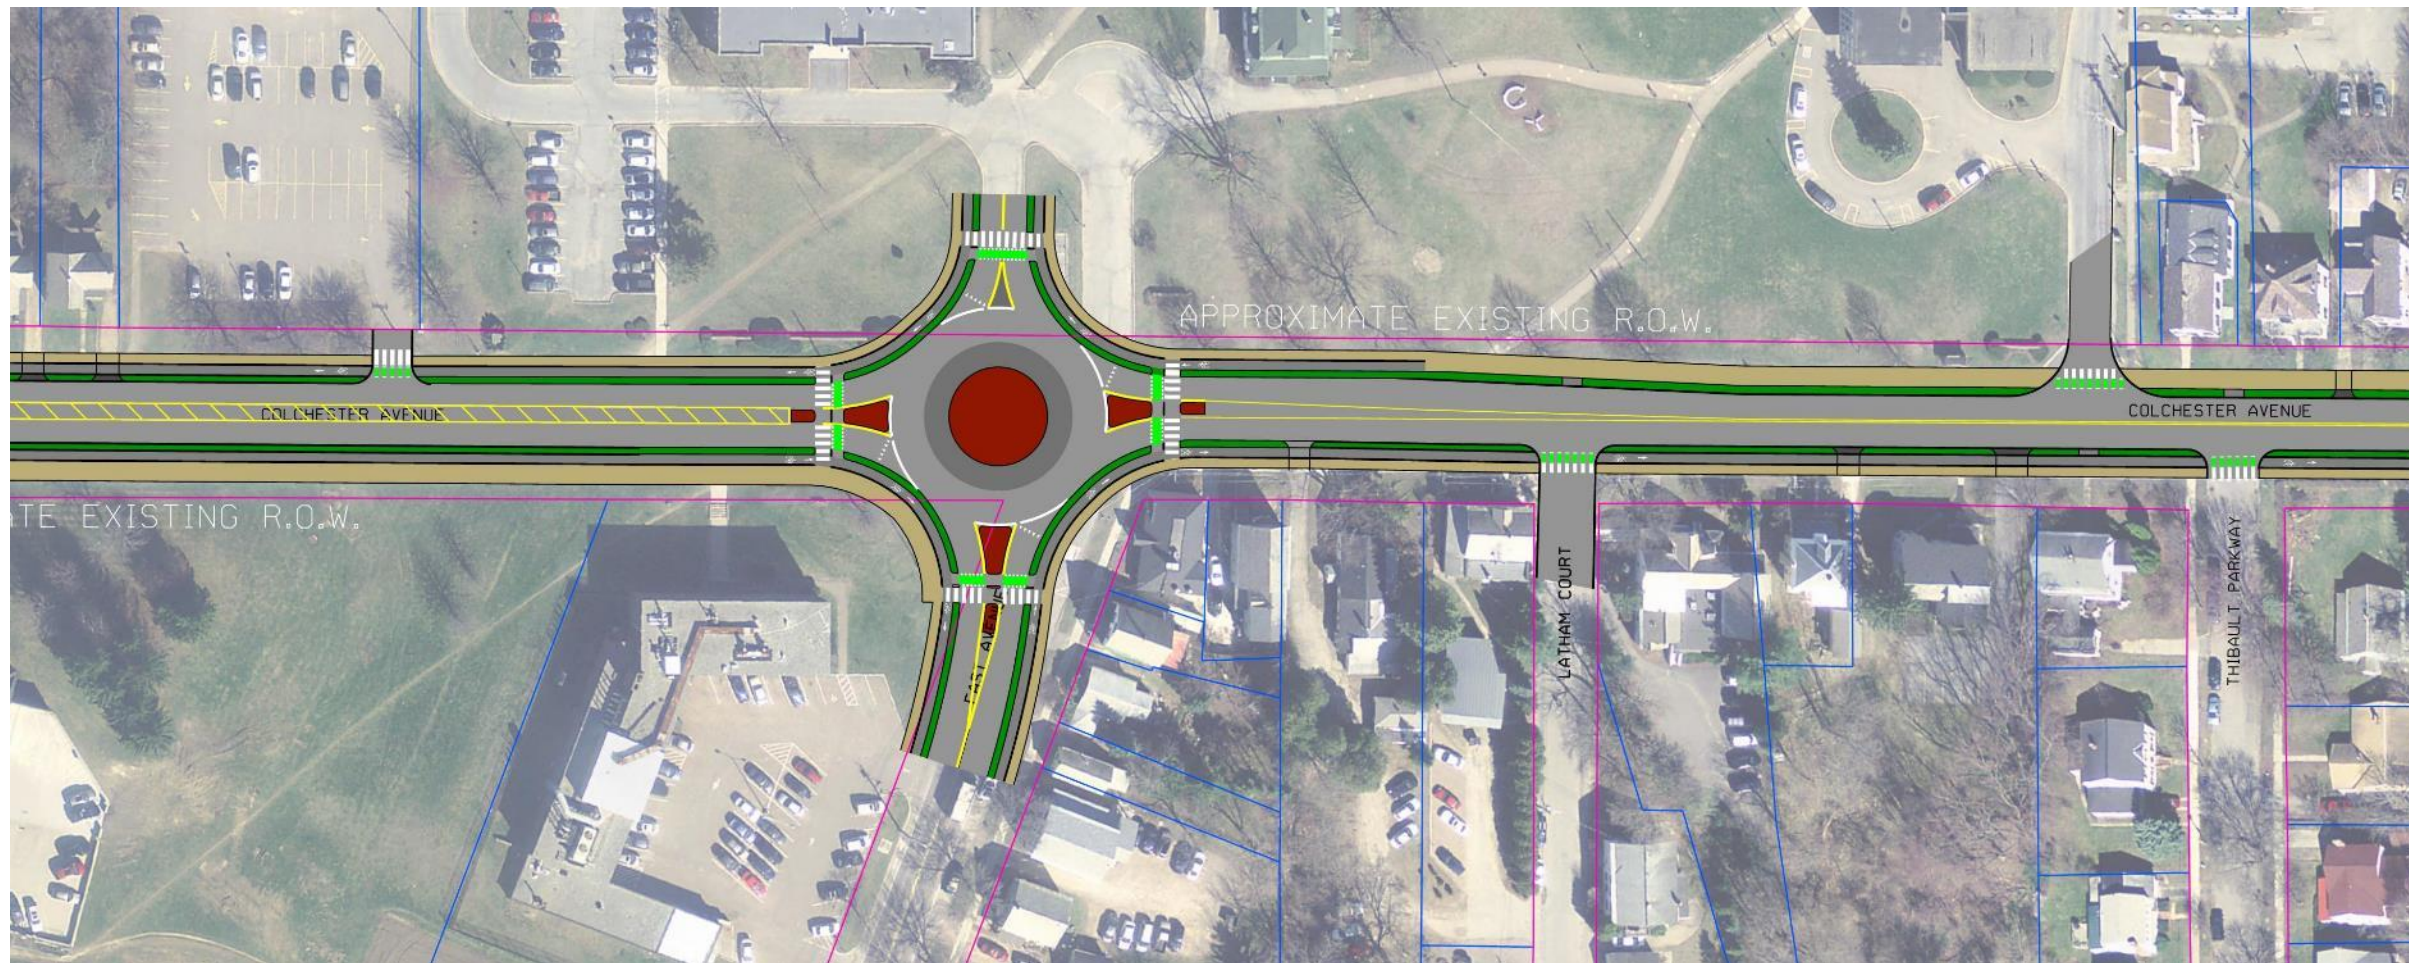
Colchester Ave & East Ave Intersection Alternative 4: Roundabout
